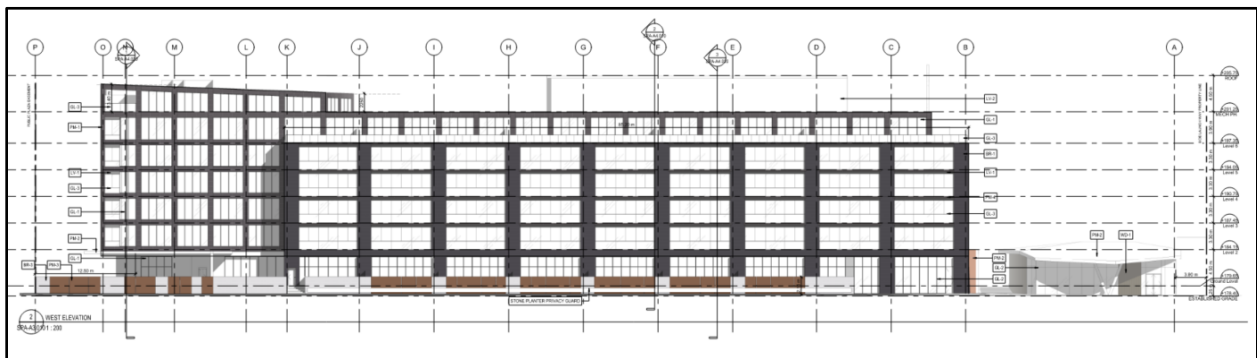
West (side) elevation of the proposed building as seen from the Launch basin of the harbour
